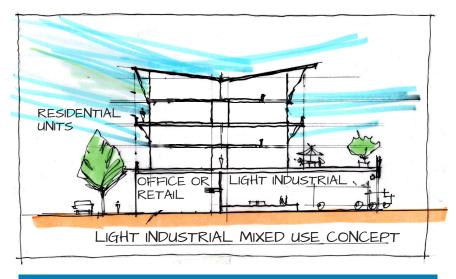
Example of a light industrial and residential mixed use building, showing how residential units might be set back from the loading areas.
